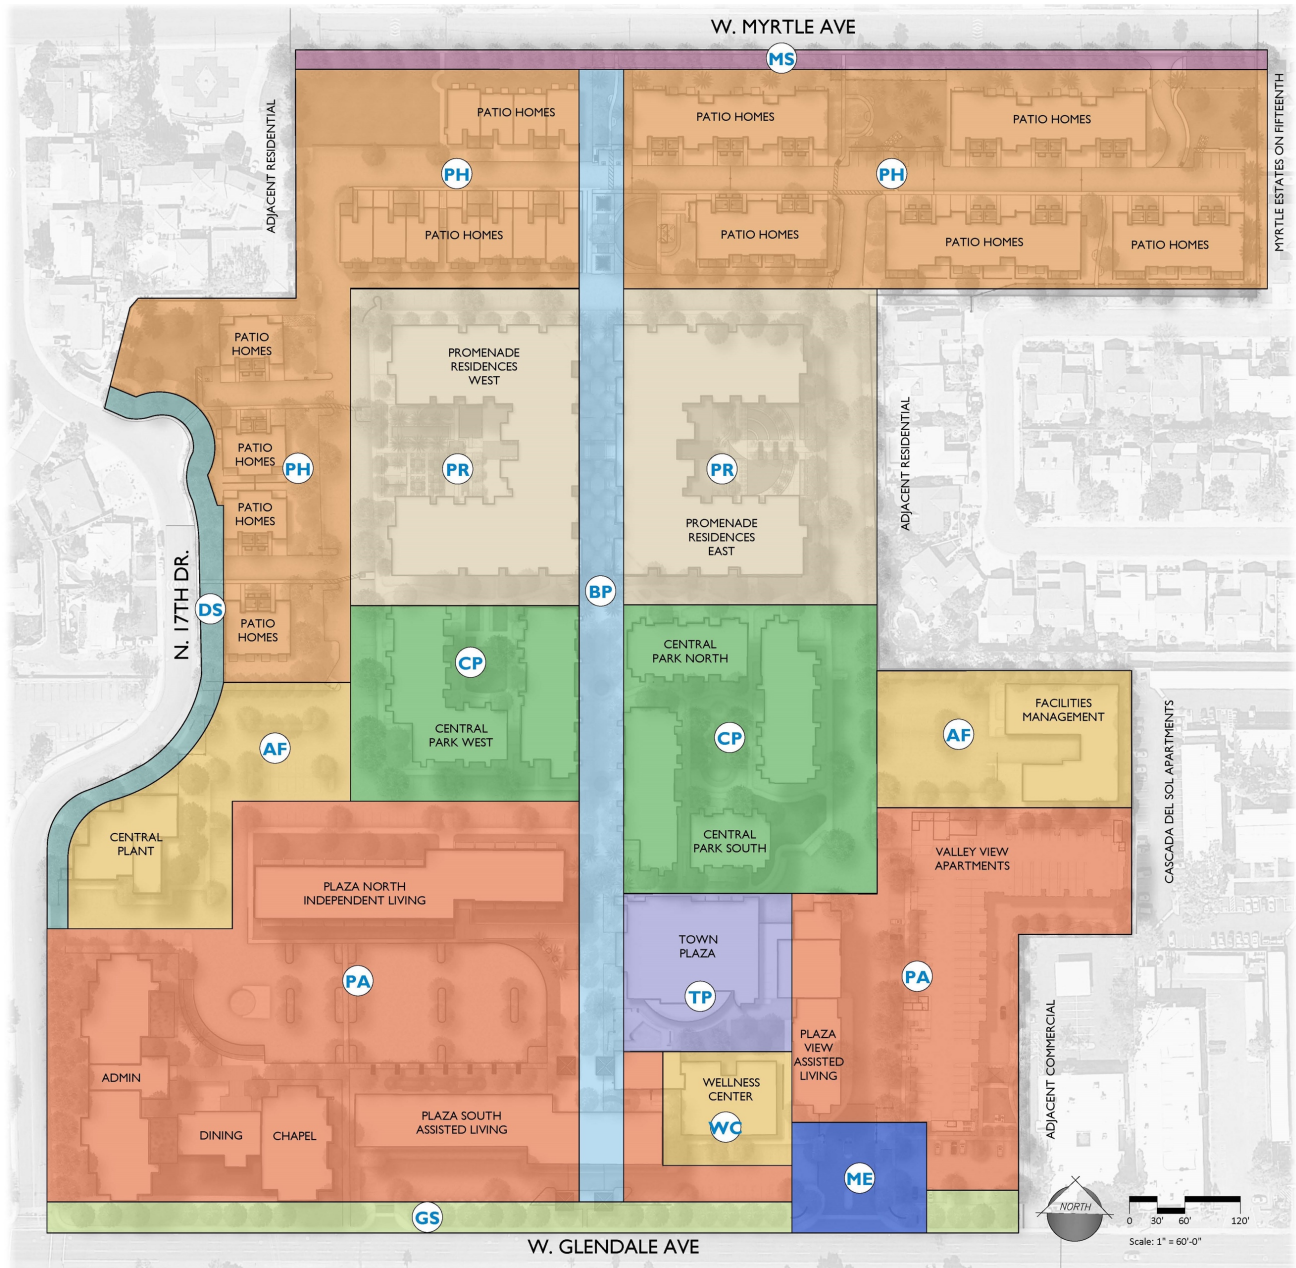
CONCEPTUAL LANDSCAPE PLAN
